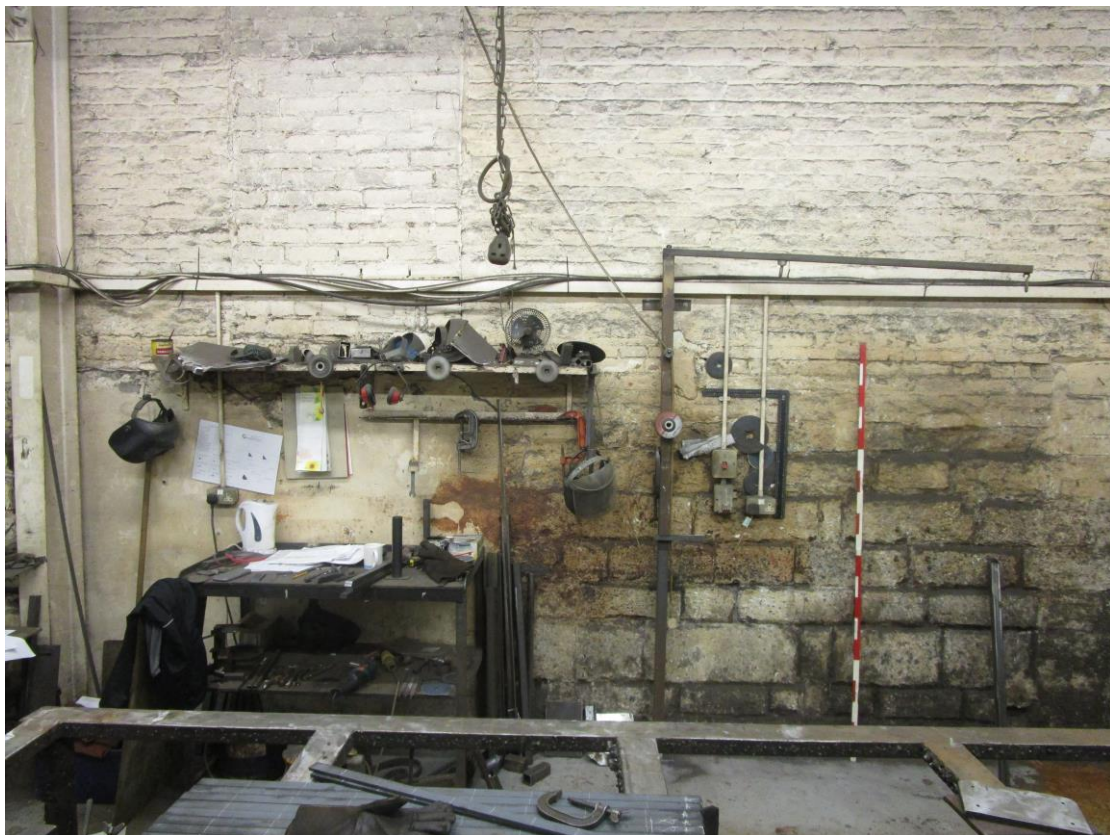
; Rear wall of mill showing masonry, brickwork and blocked ?door
